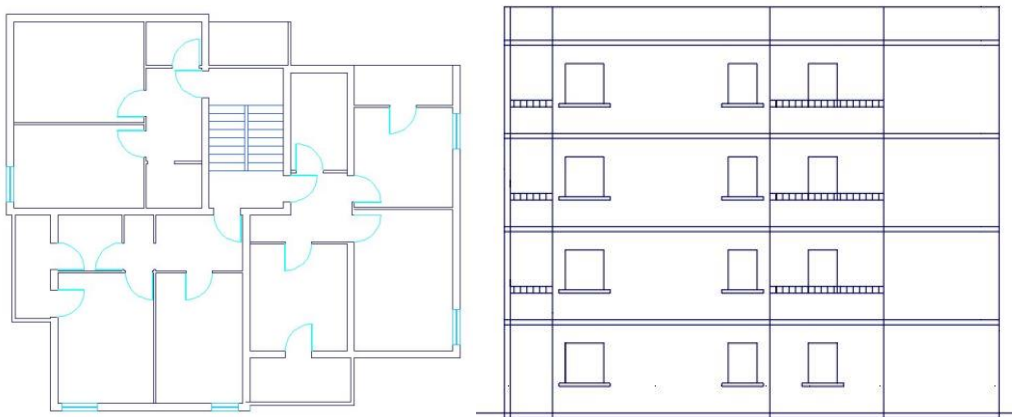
Template B2 plan and façade view [AQTN, 2018]
